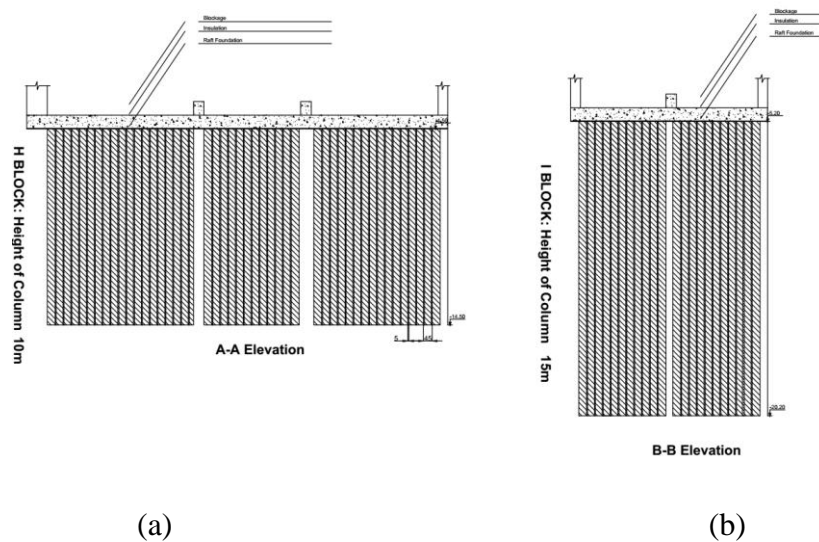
Elevation drawings of jet grout cells (a): the section of H block, (b): the section of I block.
